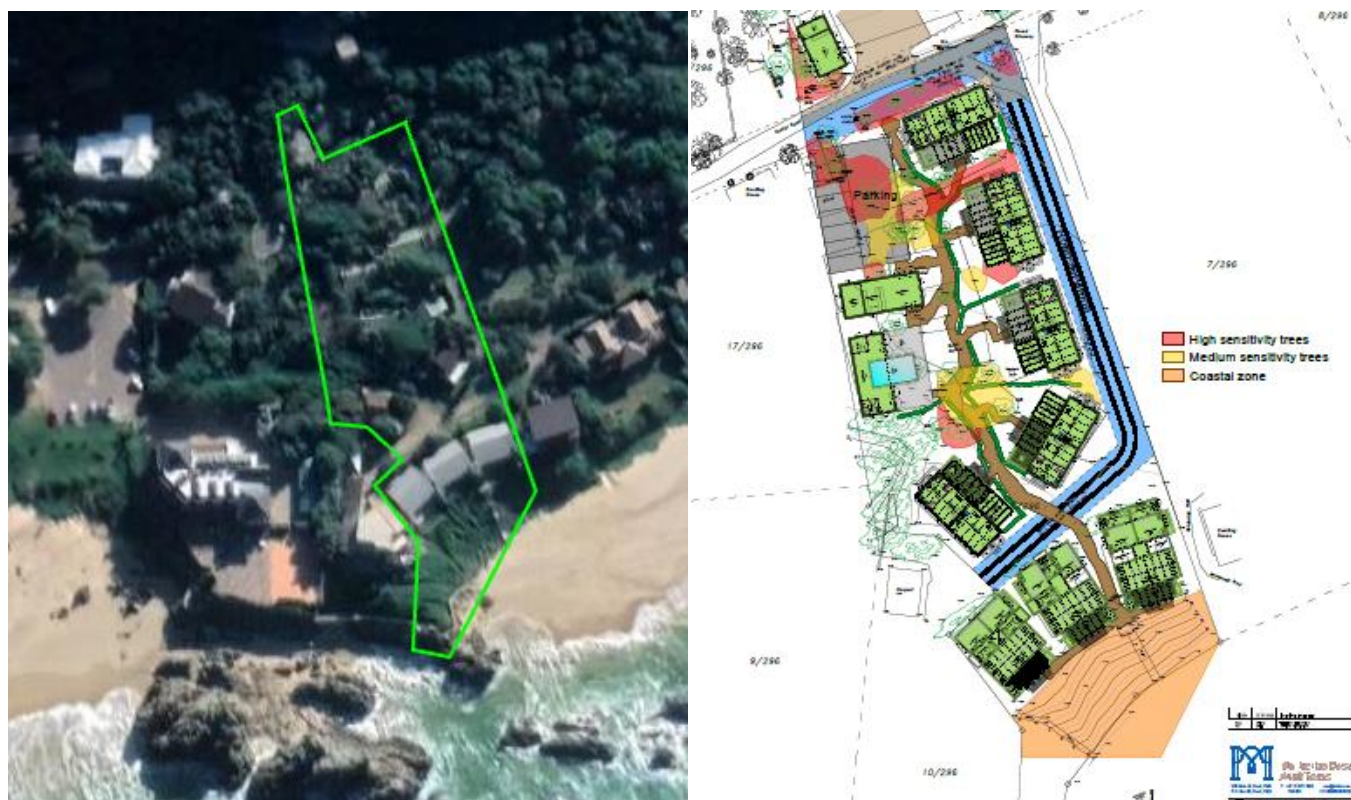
Setting and current layout of the property (left, Google Satellite) and new dwelling site plan (right, Malherbe Rust Architects)
